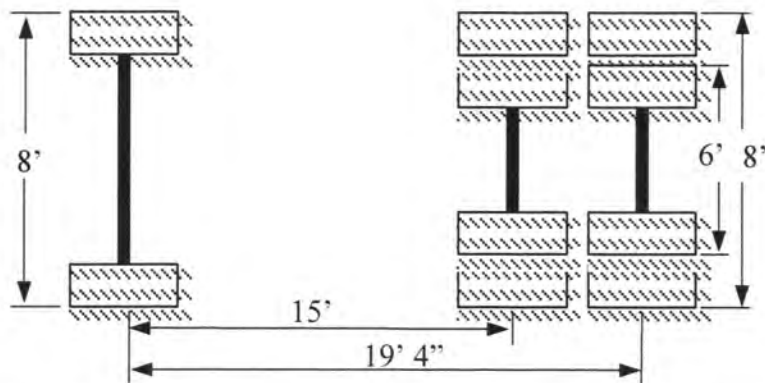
Load truck dimensions from De Soto Bridge test.
